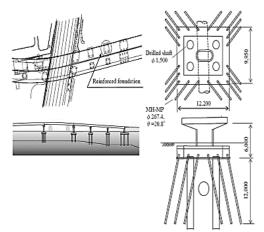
Retrofitting plans for Yokohama Bridge Japan piers [17].
